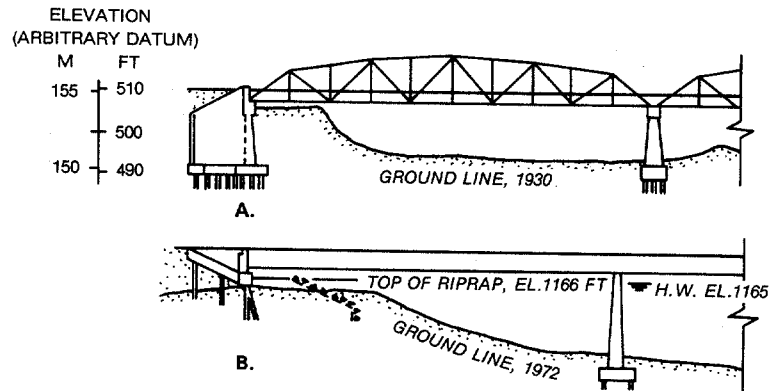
A, elevation sketch showing left abutment of bridge built in 1932. B, left abutment of bridge built in 1973.
